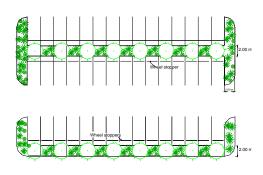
An illustration of the need to use wheel stoppers to protect landscaping and the need to landscape all parking edges and between parking bays.
